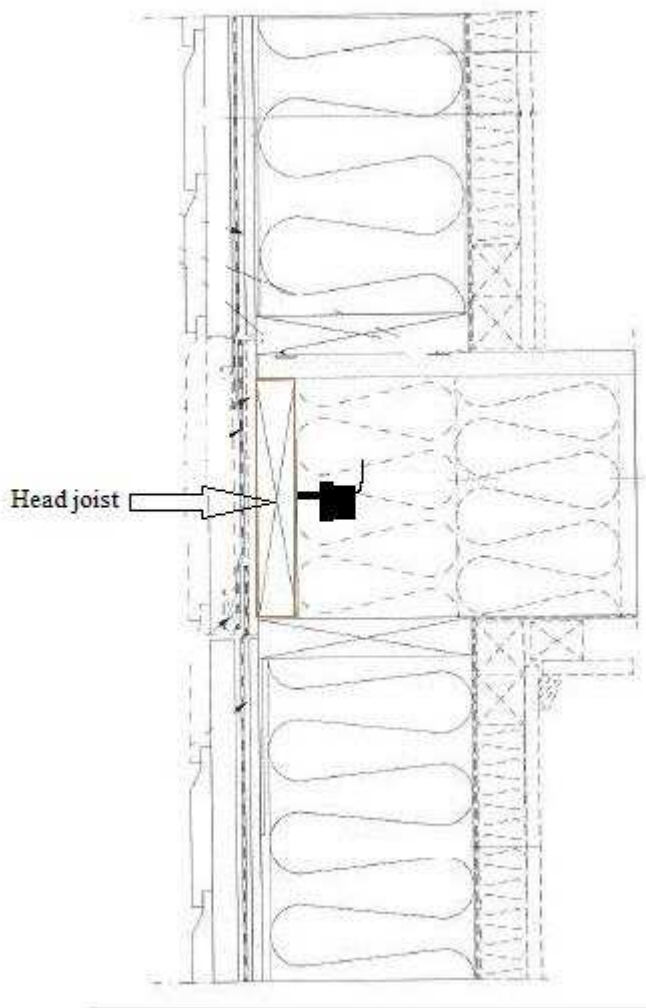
Element detail given by the building producer, showing the building layers of the floor and wall elements, as well as the placement of the sensor on the head joist
